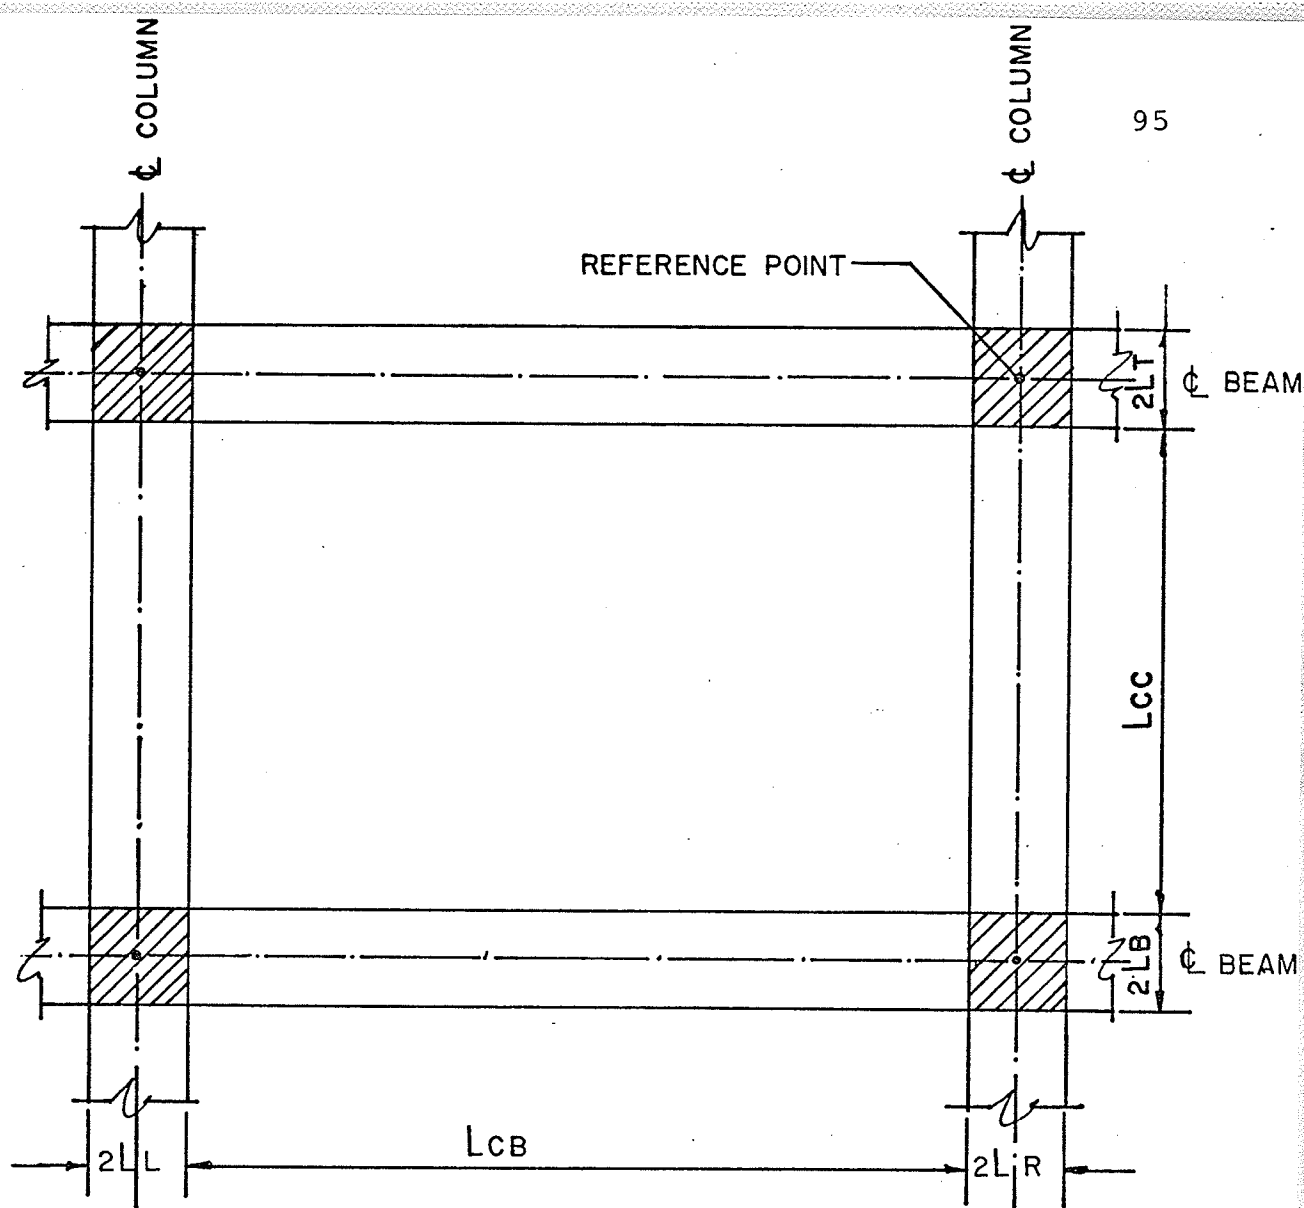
INTERSECTION OF COLUMNS & BEAMS
